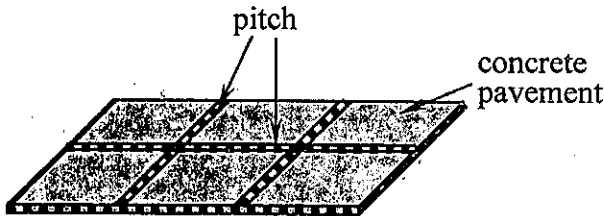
Making allowance to the expansion of concrete pavements and road surface
